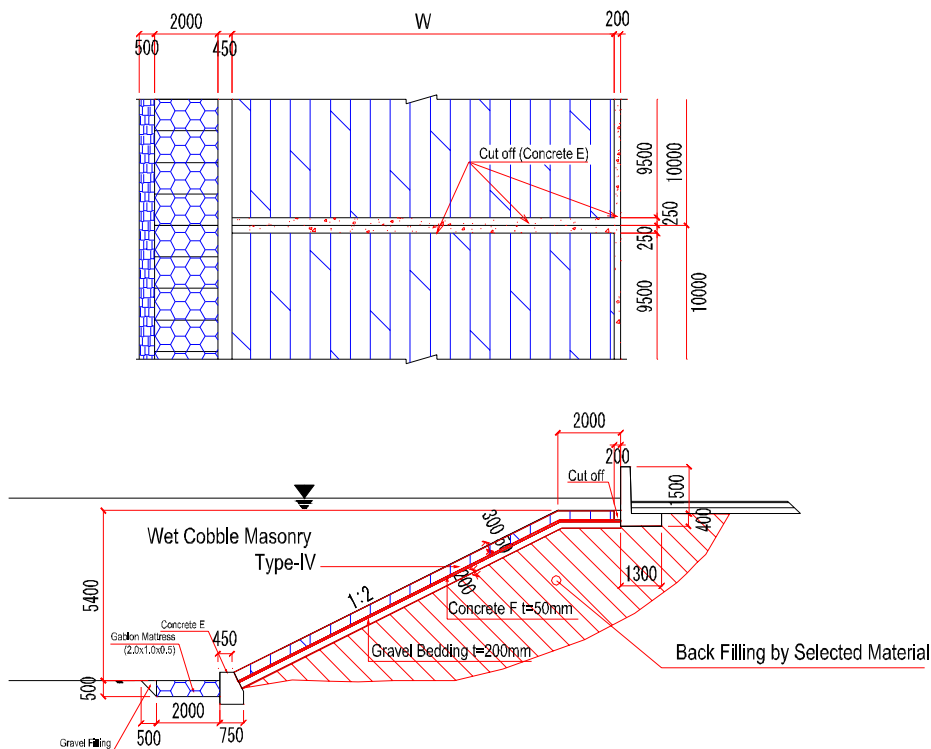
Cross Section of Wet Cobble Masonry
